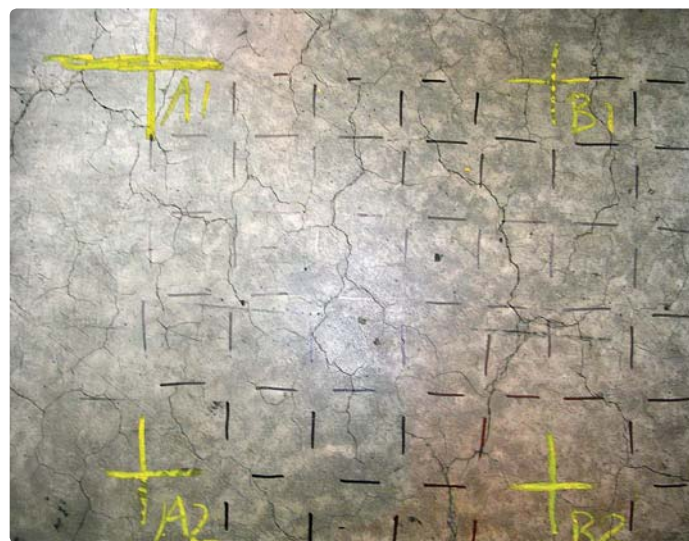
top: Excessive cracking in a conventionally reinforced floor.
